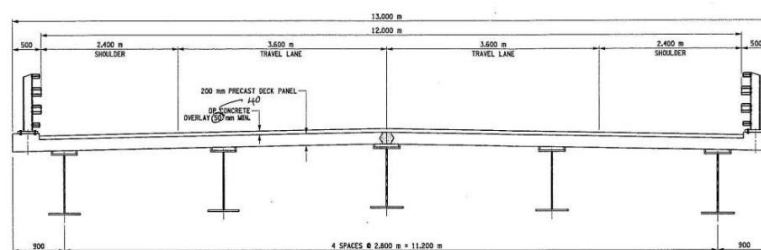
Transverse bridge section of precast panels and centerline UHPPC joint fill
